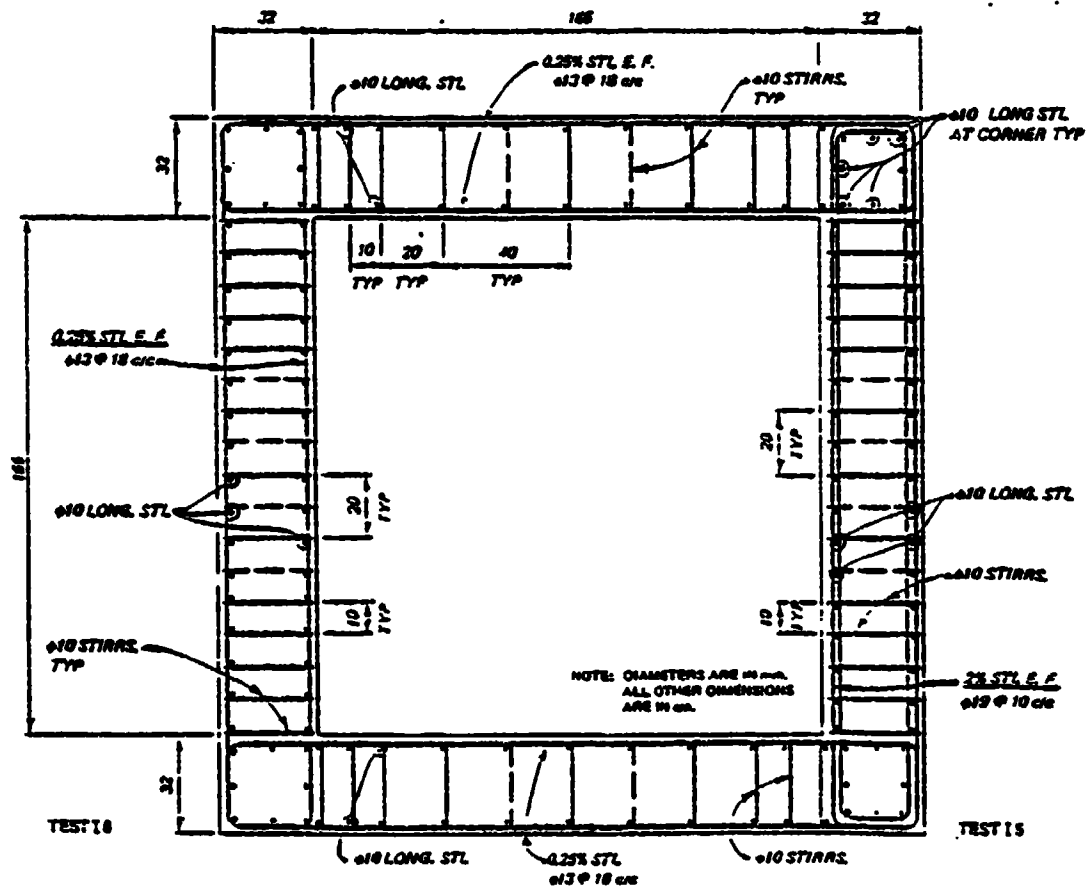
Reinforcement detail for a blast resistant box culvert. (Coltharp et al.'85)
